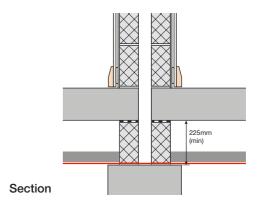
Gas membrane installed at lower level with layer of concrete over for protection.
